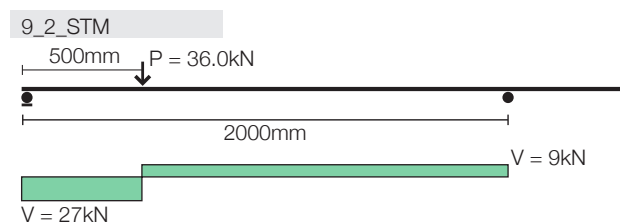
Loading layout for Beam 9\_2\_STM.
